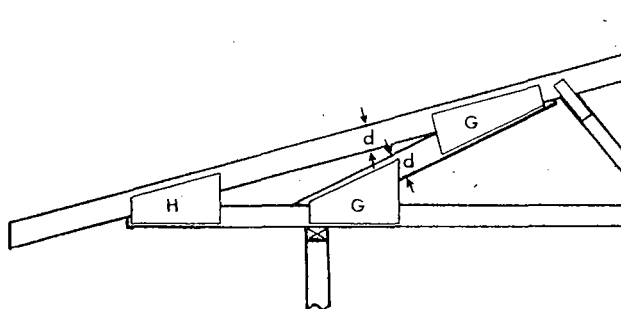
Recommended method of modifying truss for use over shortened span. Number of fastenings in gusset (G) to be the same as in heel joint (H).
